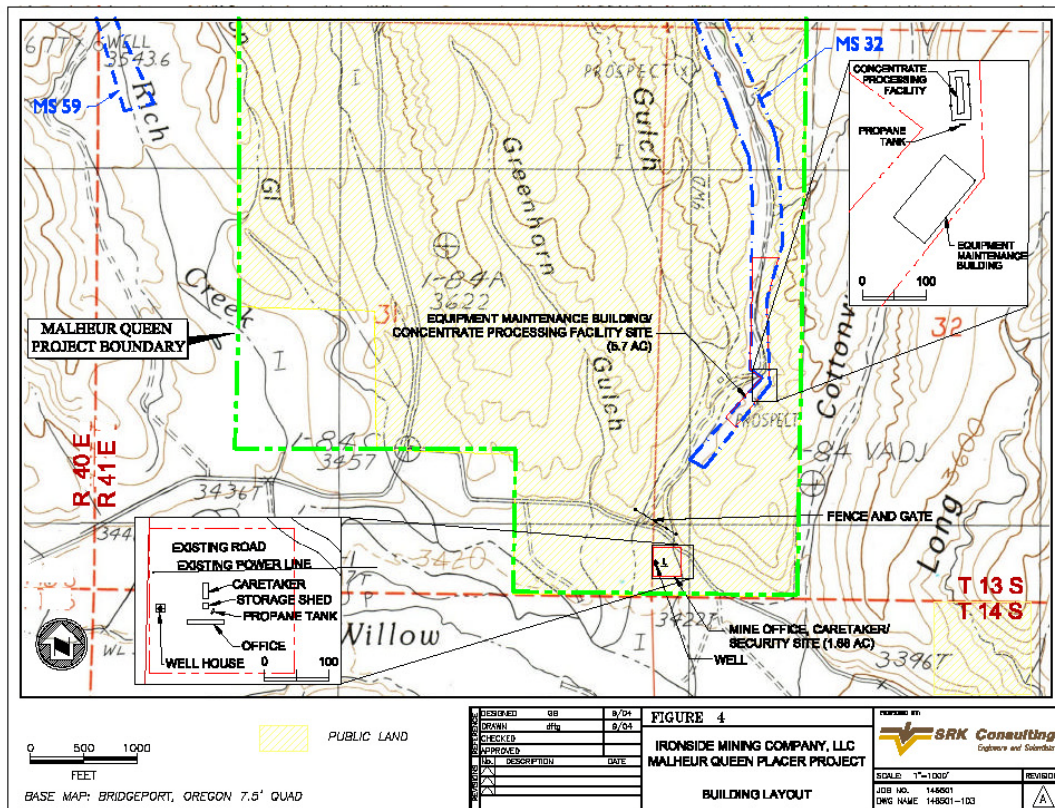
Malheur Queen Placer Project building and facility lay-out(from SRK POO).
